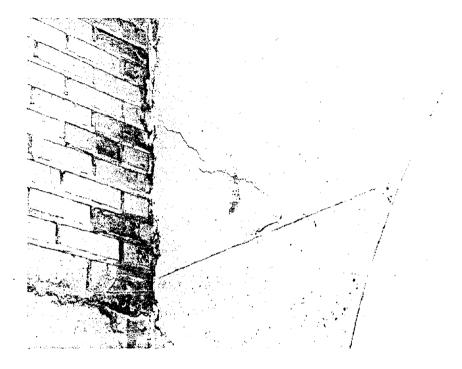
CRACK IN THE REINFORCED CONCRETE FRAMES SUPPORTING BOILER HOUSE ROOF (BUILDING 40)
